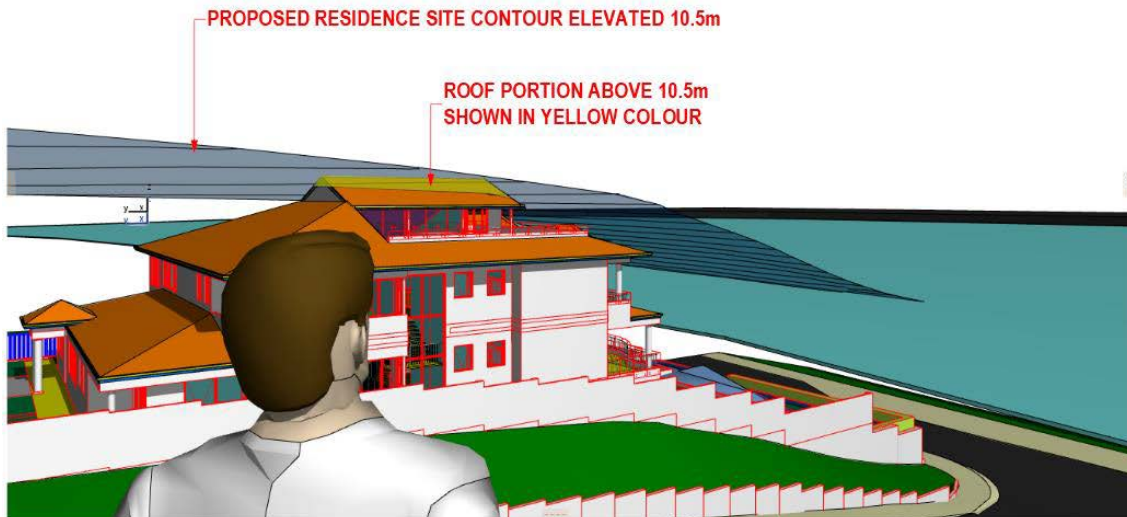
Applicant's perspective view of the proposed dwelling as viewed from the balcony at 22 Rookwood Street, Mount Pleasant.
